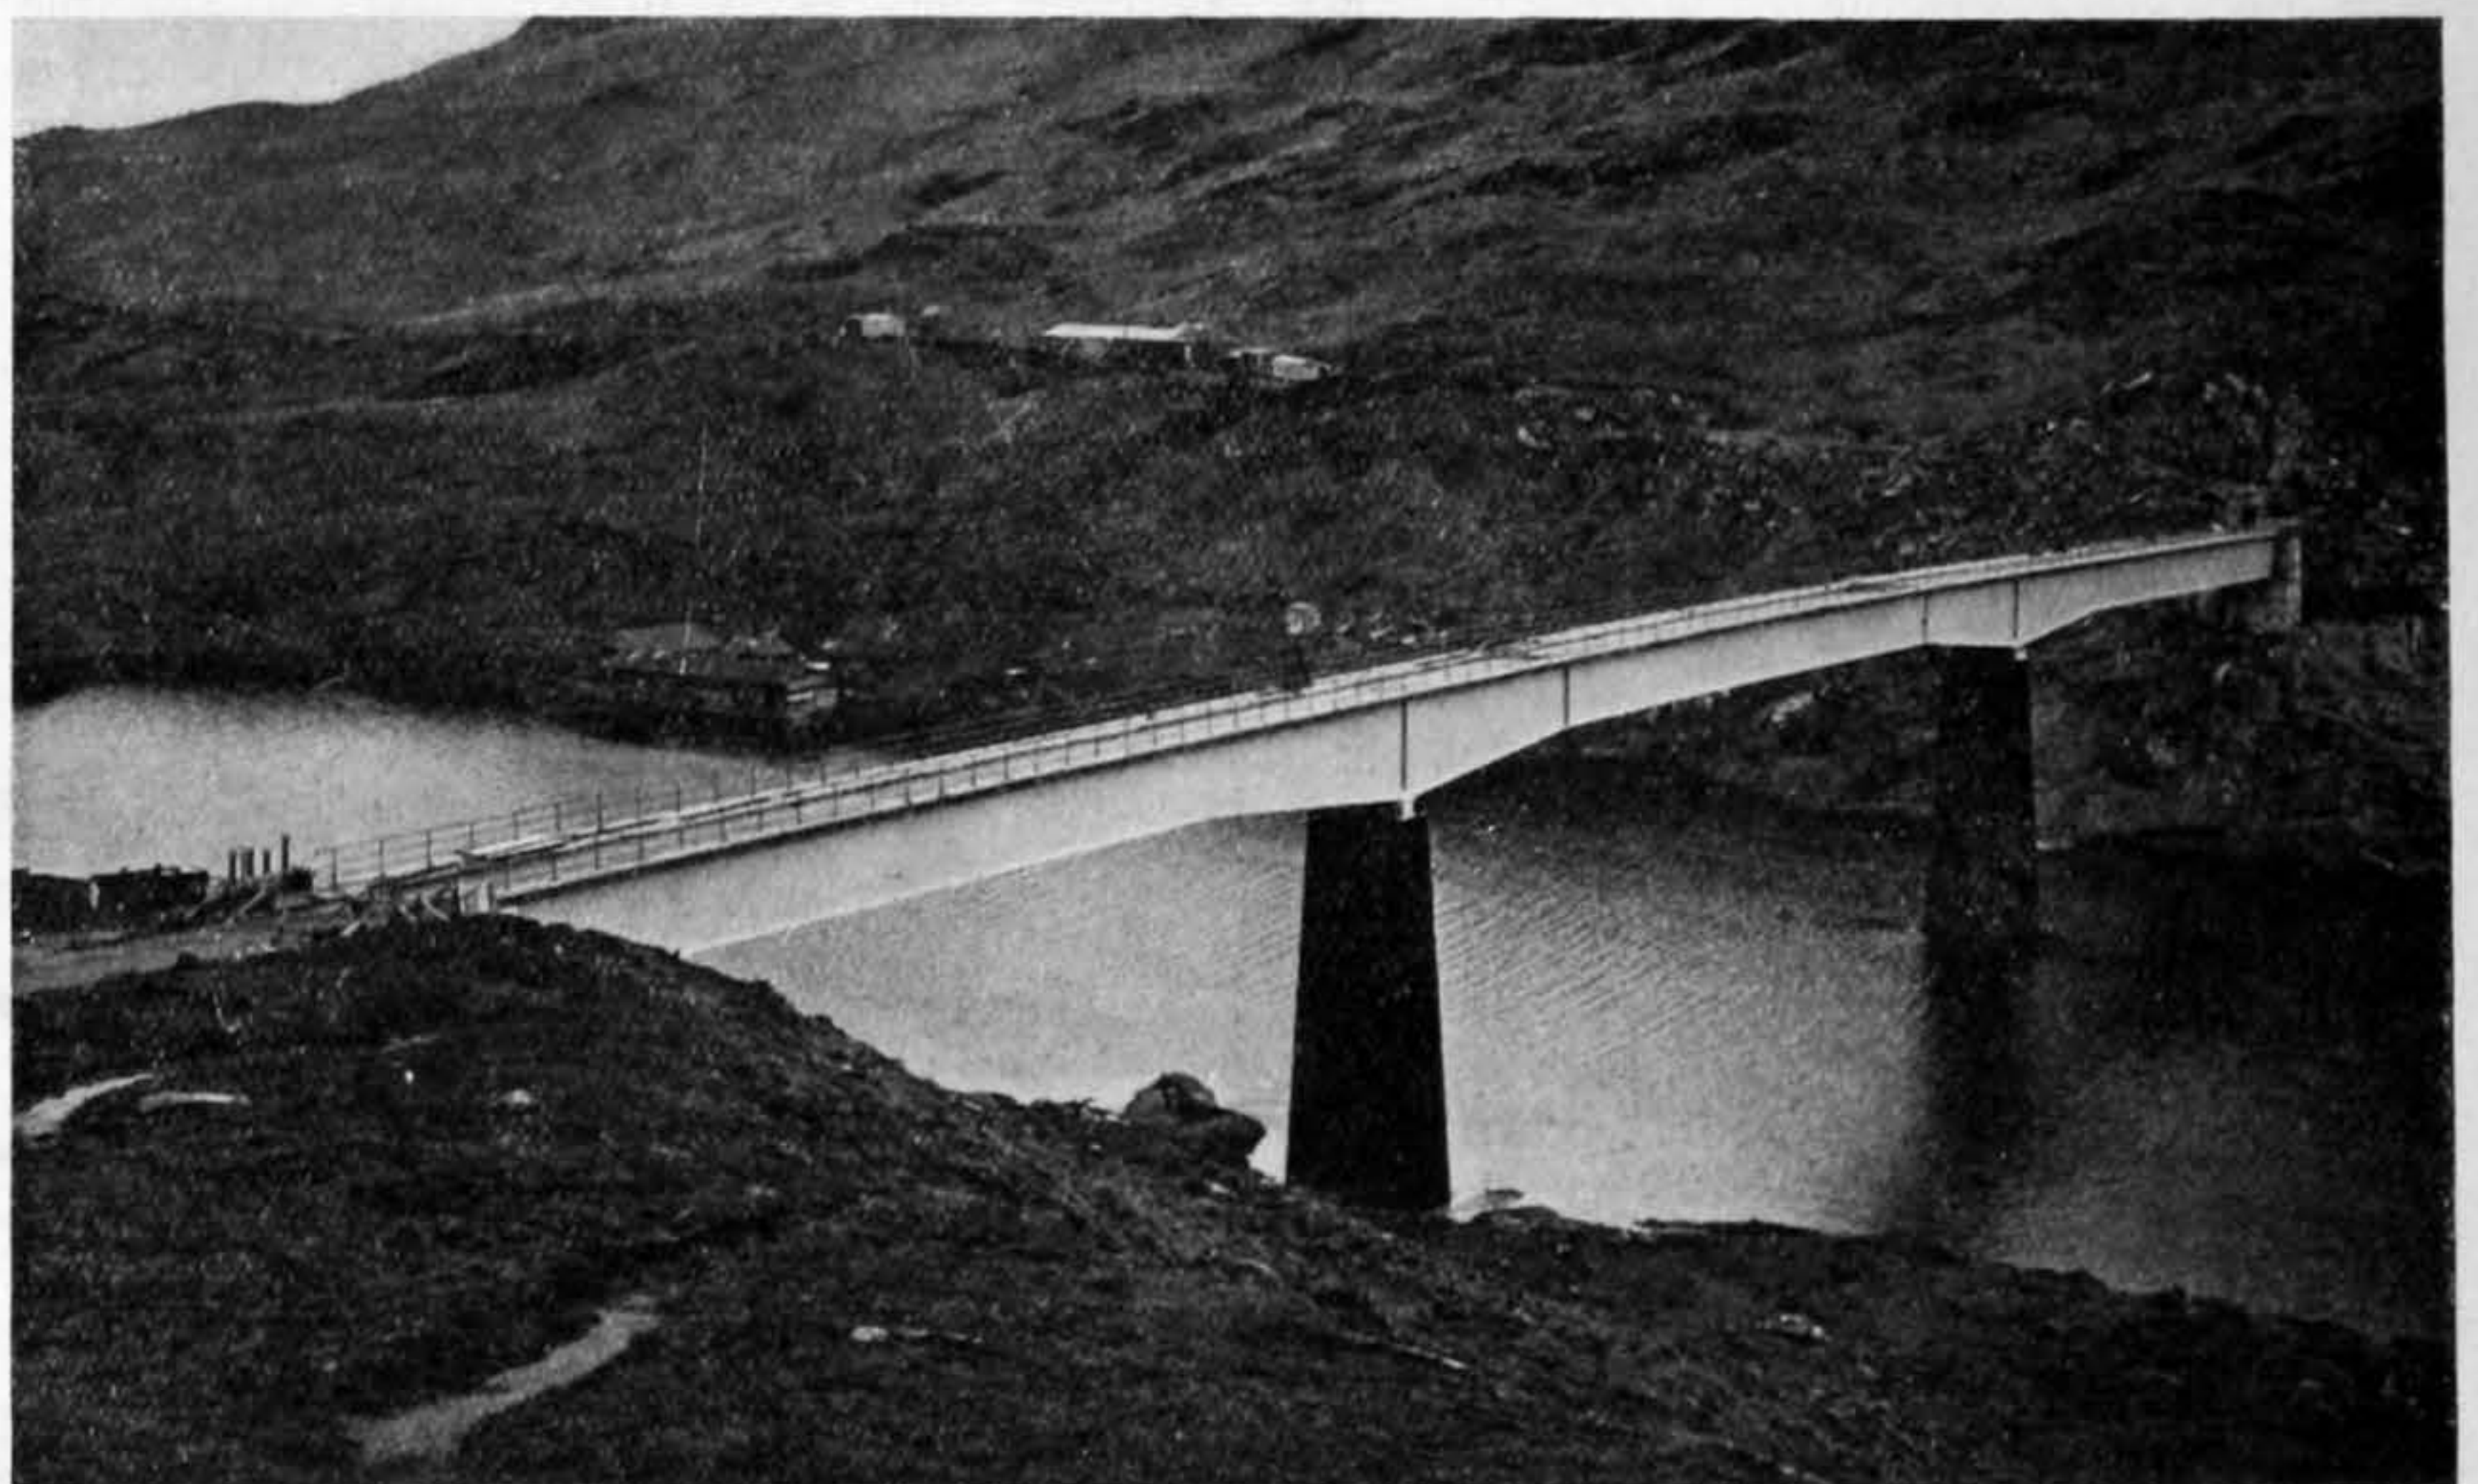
Glen Quoich bridge. The bridge is of welded construction, with roadway slabs—each the full width of the bridge—of precast concrete
